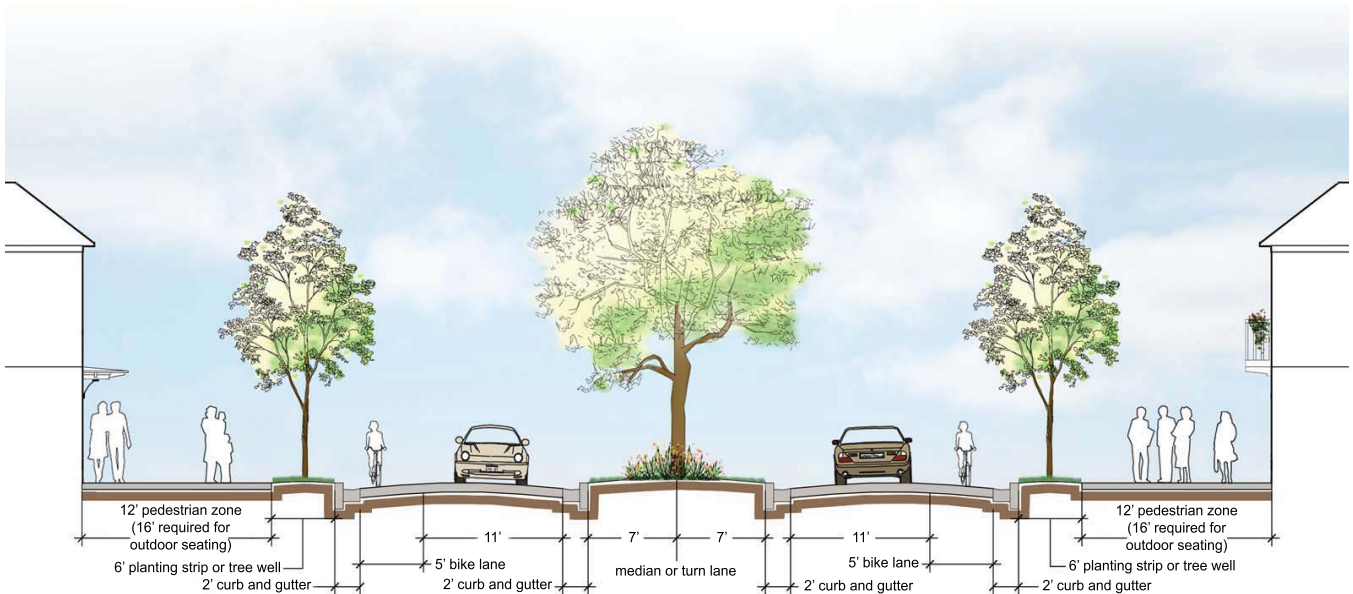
CORRIDOR ROAD CROSS SECTION B1/B2 - 2 LANE - 98' Right-Of-Way
